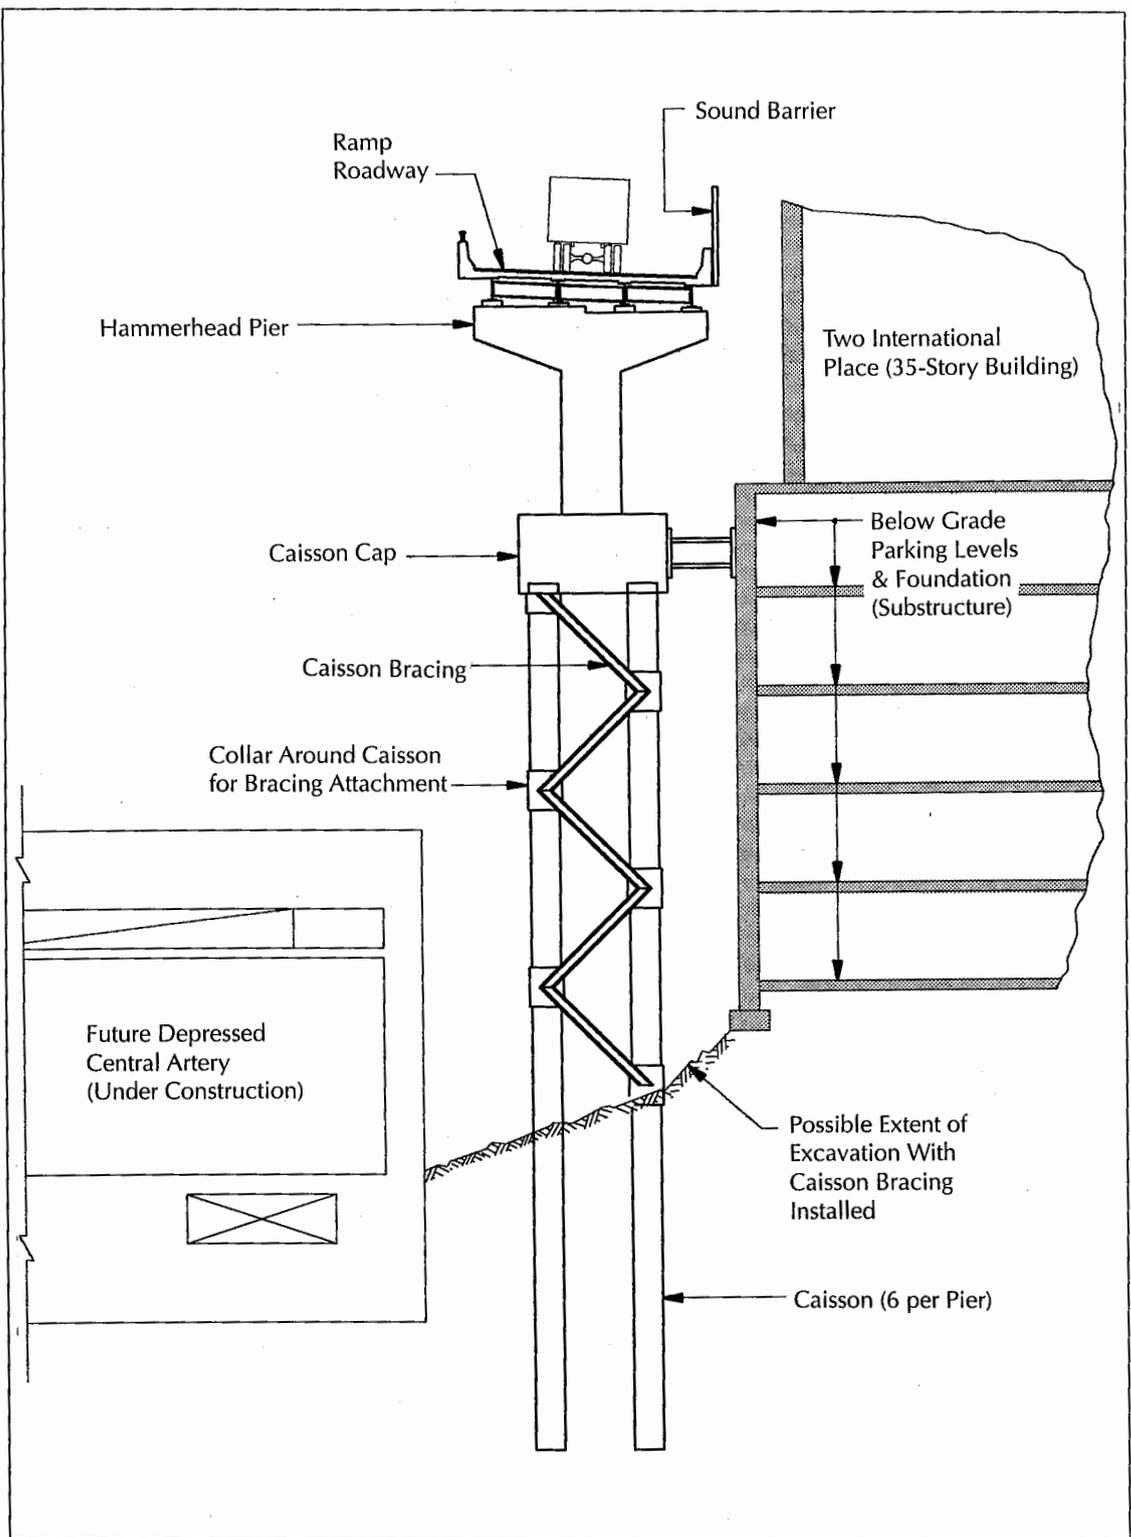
Cross section of the reinforced concrete pier during the construction of depressed Central Artery.
